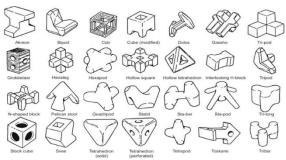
Types of shape design concrete block (Artificial Armor Block)
